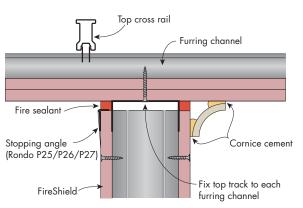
Wall Head to Suspended Ceiling Finishing Detail
